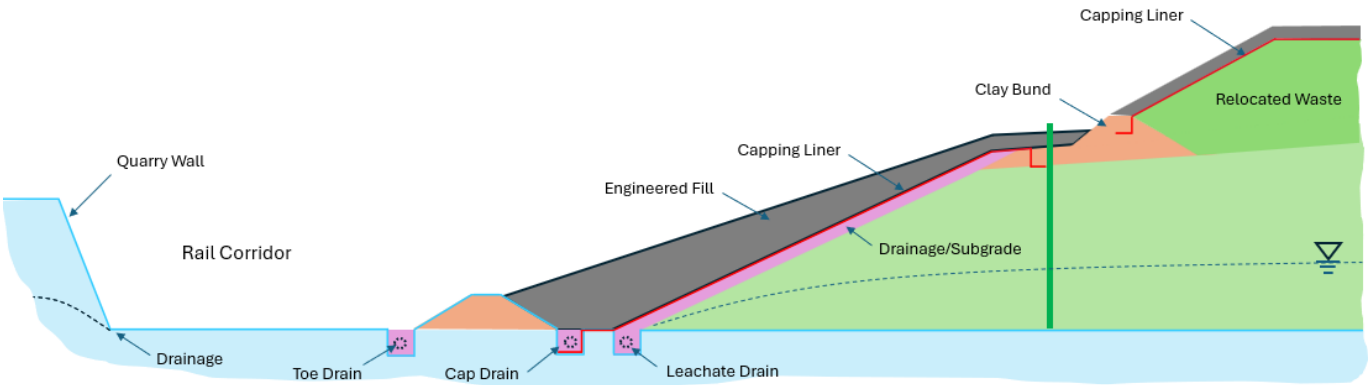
below shows illustratively how Cells A & B could appear after the proposed waste reprofiling work. Following the waste excavation and toe berm construction, the temporary waste slope will be prepared by placing a layer of drainage/subgrade suitable for receiving the lining system. The capping liner is currently envisaged to comprise a 1mm thick textured Linear Low-Density Polyethylene (LLDPE) geomembrane overlying a protection geo-textile/geo-composite layer. Suitable engineering fill material will then be placed between the lining system and the toe berm to form a shallower slope angle with improved slope stability in the long-term. The relocated waste at the top will also be sealed with the same lining system to achieve long-term containment.
